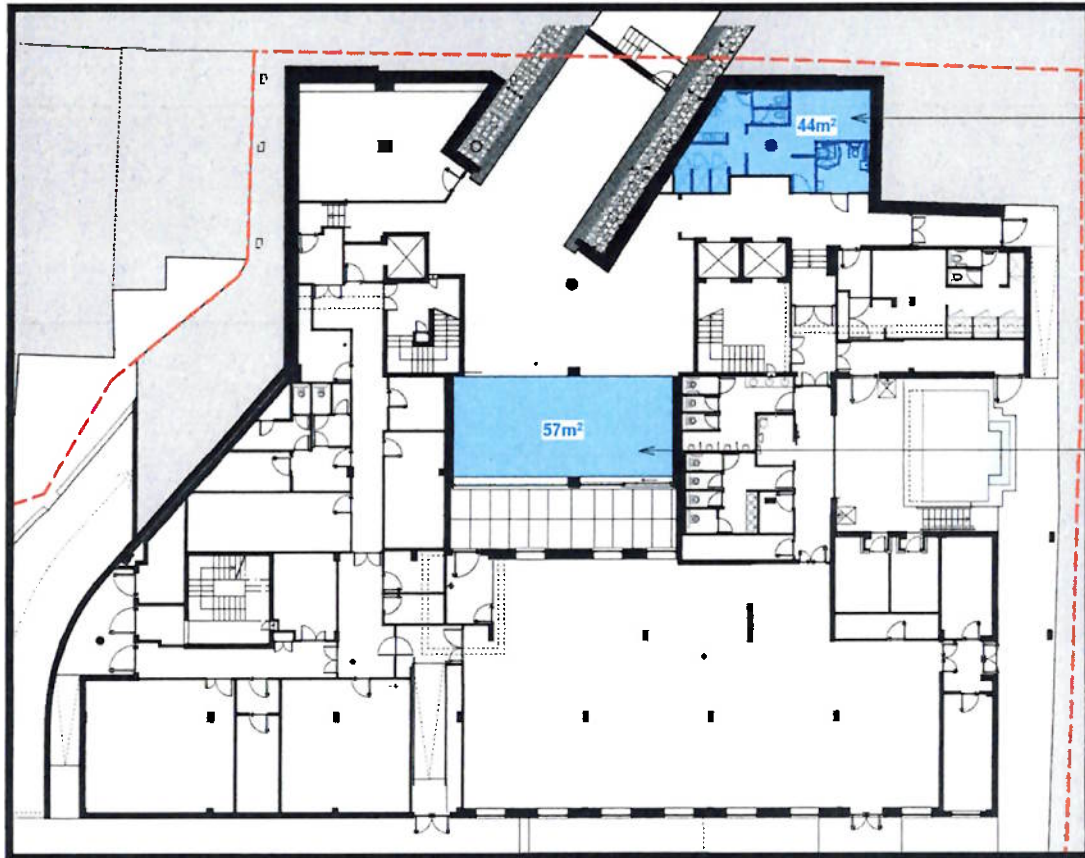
Extract from Dwg S5.01 "Existing Lower Ground Floor Plan" prepared by Lawrence & Long Architects, with the subject small increases in gross floor area shaded blue.
